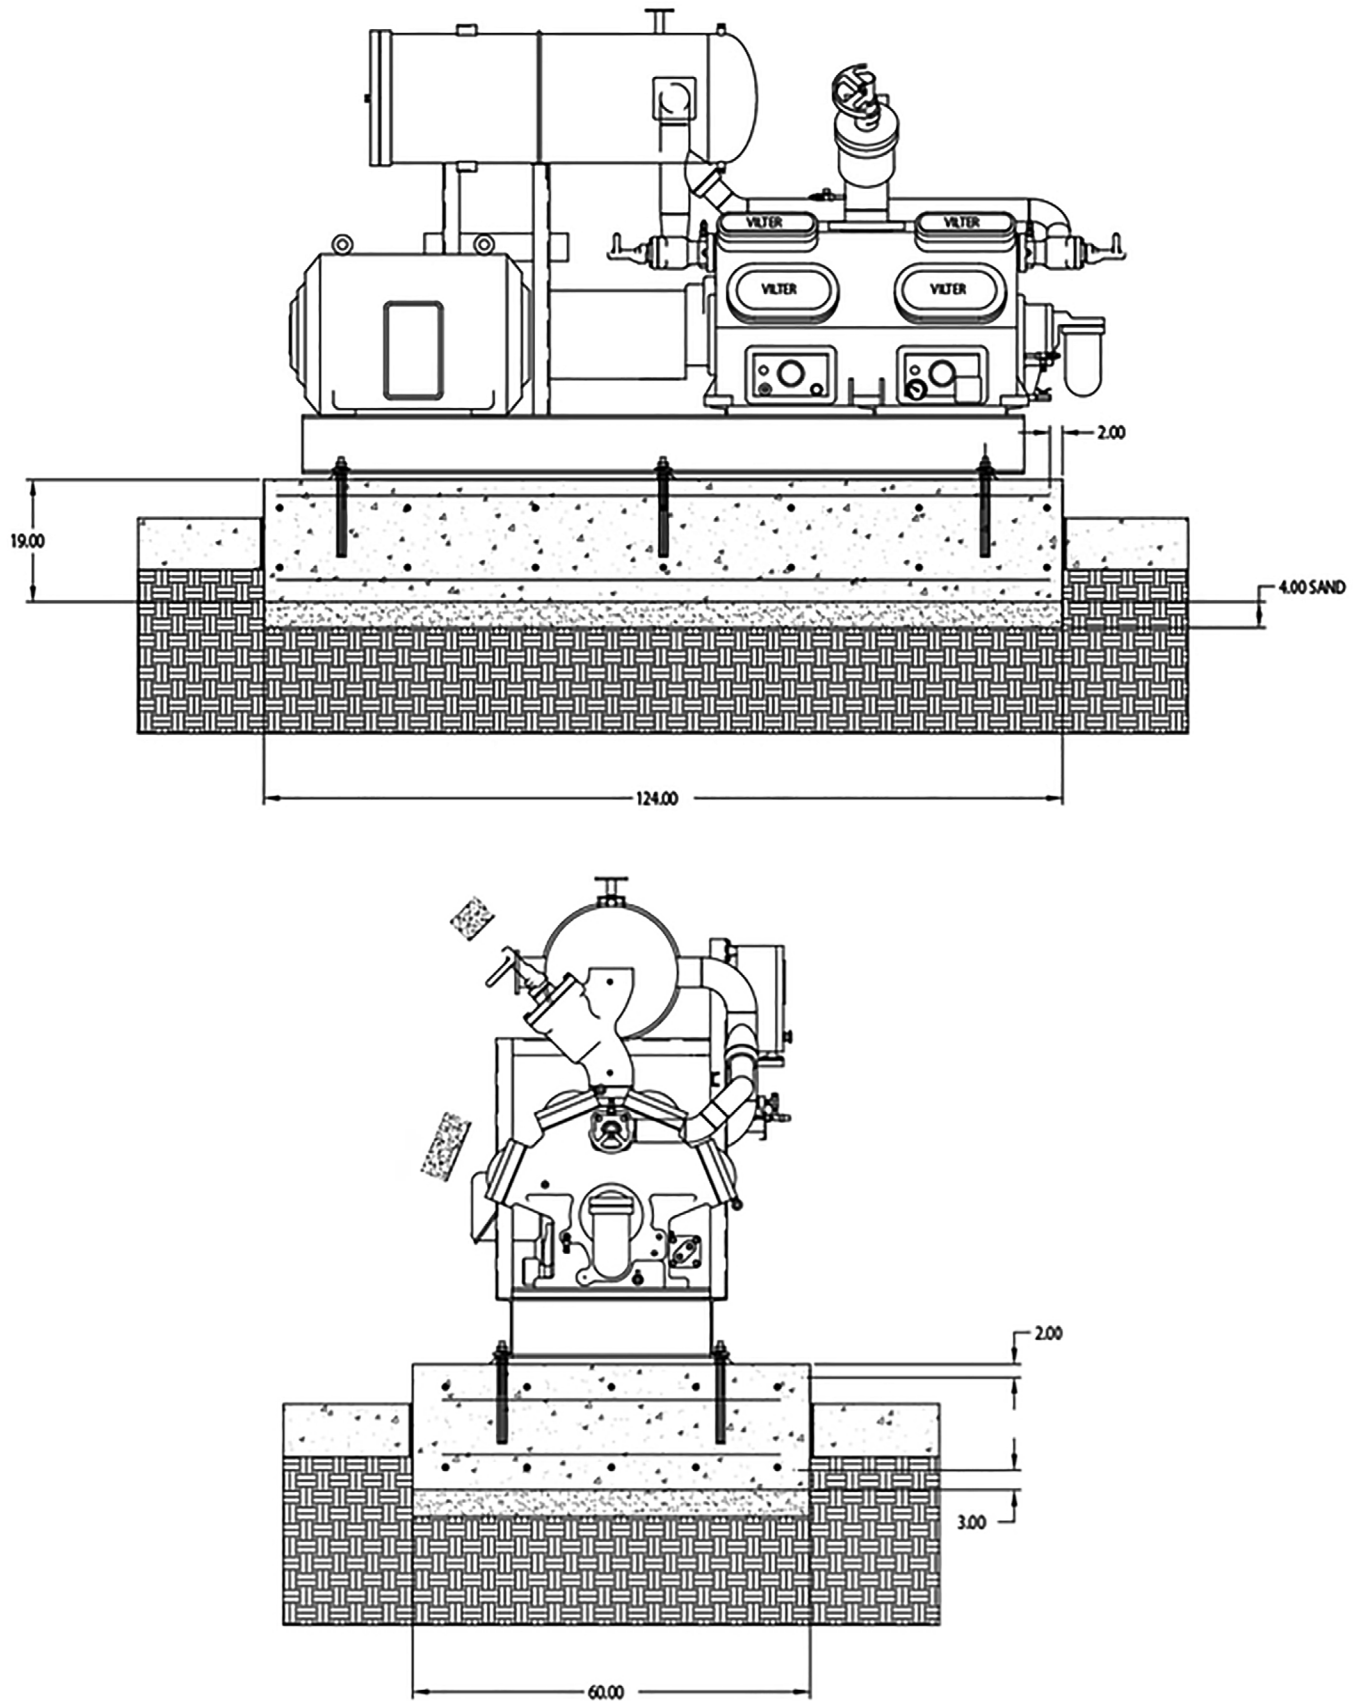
Compressor Unit and Foundation Dimensions – 12 and 16 Cylinder (6 of 6)
